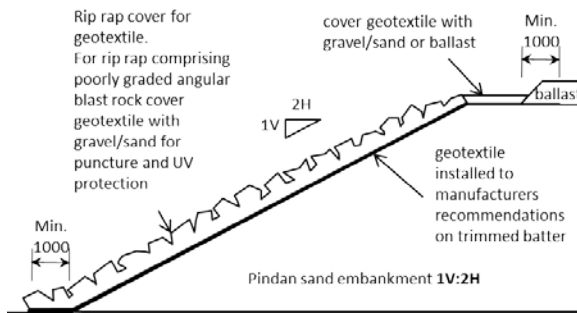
Example detail of recommended geotextile and rip rap protection on erodible embankments.
